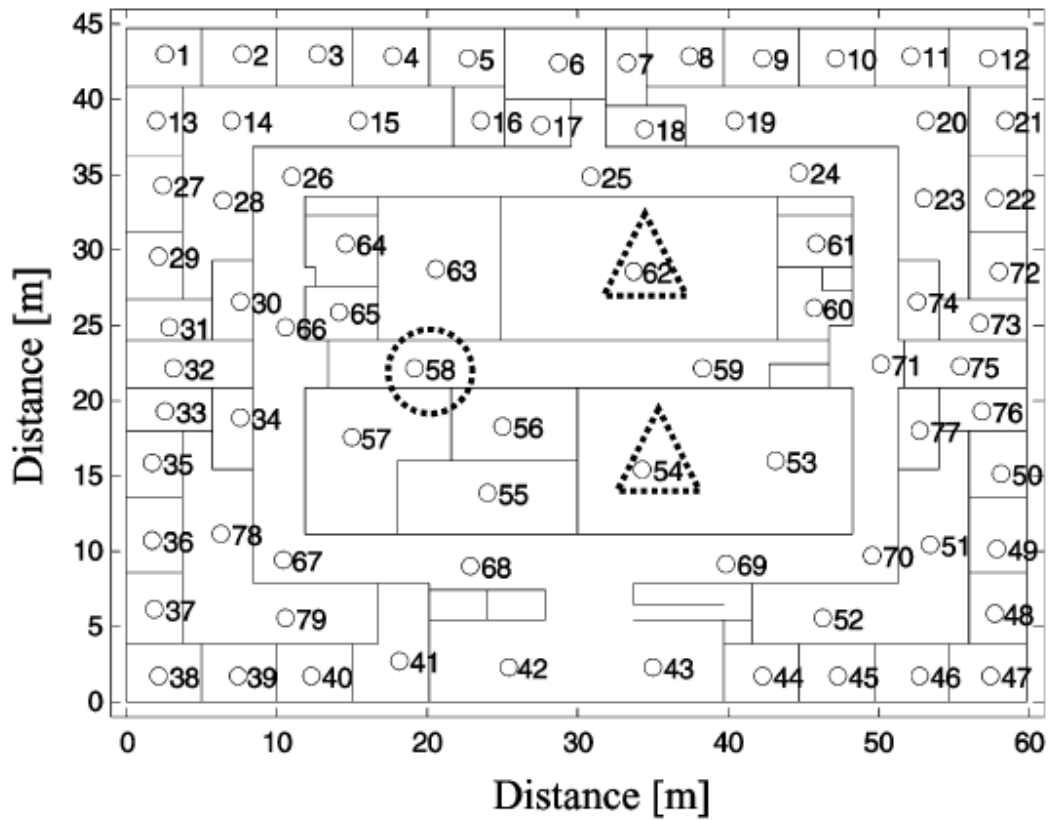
A floor plan for a typical office building and the locations of sampling points.
